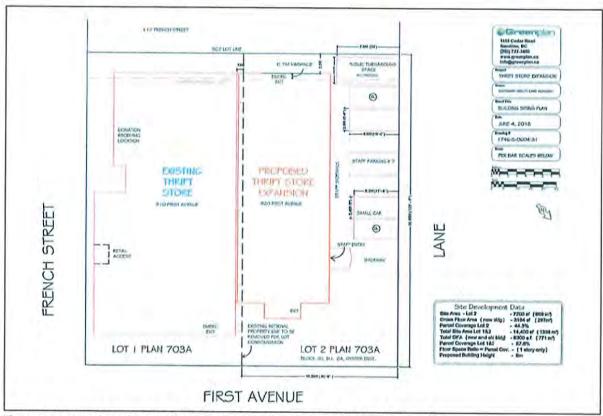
Proposed Site Plan for Thrift Store Expansion (910 and 920 First Avenue)
